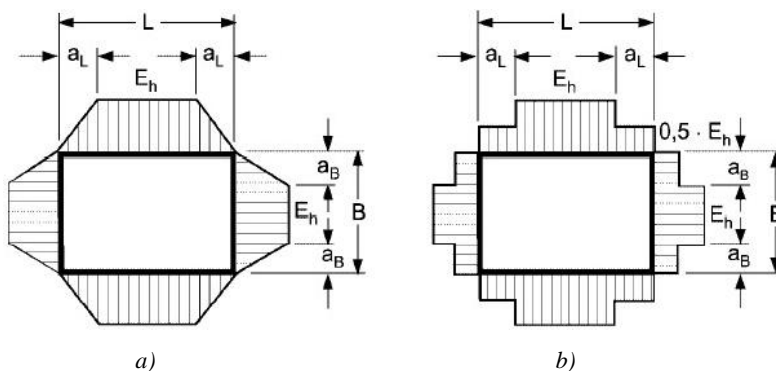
Simplified approach for earth pressure reduction at excavation corners
